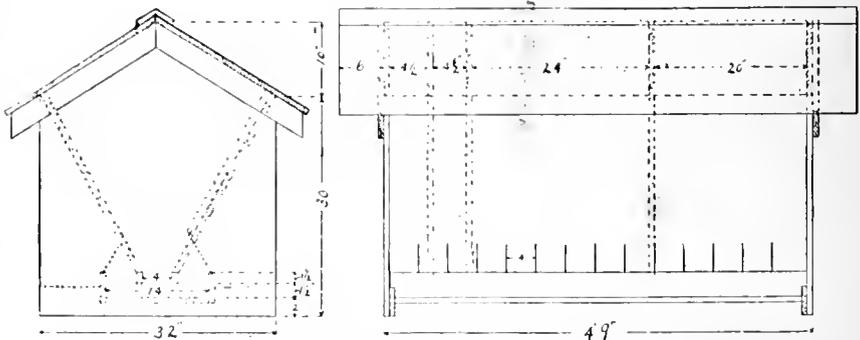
Working Plans of a Double Outdoor Hopper.
